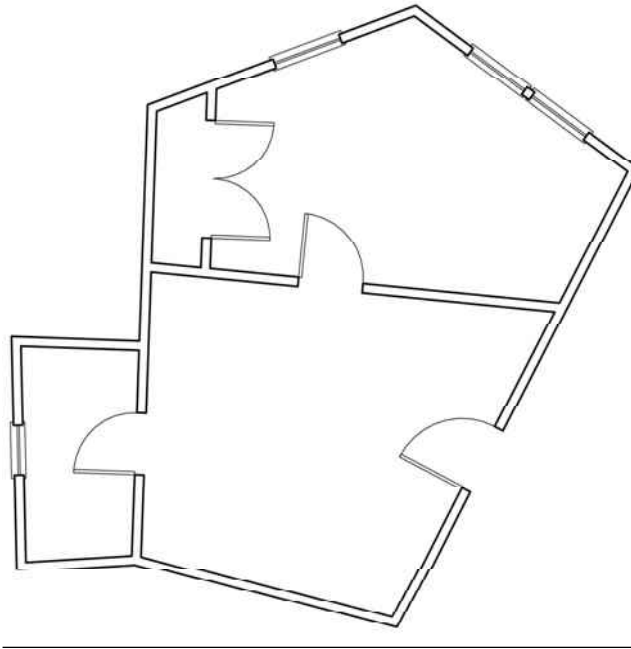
Floor plans with few orthogonal corners can be drawn quickly with the *Walls&Gaps* tool
